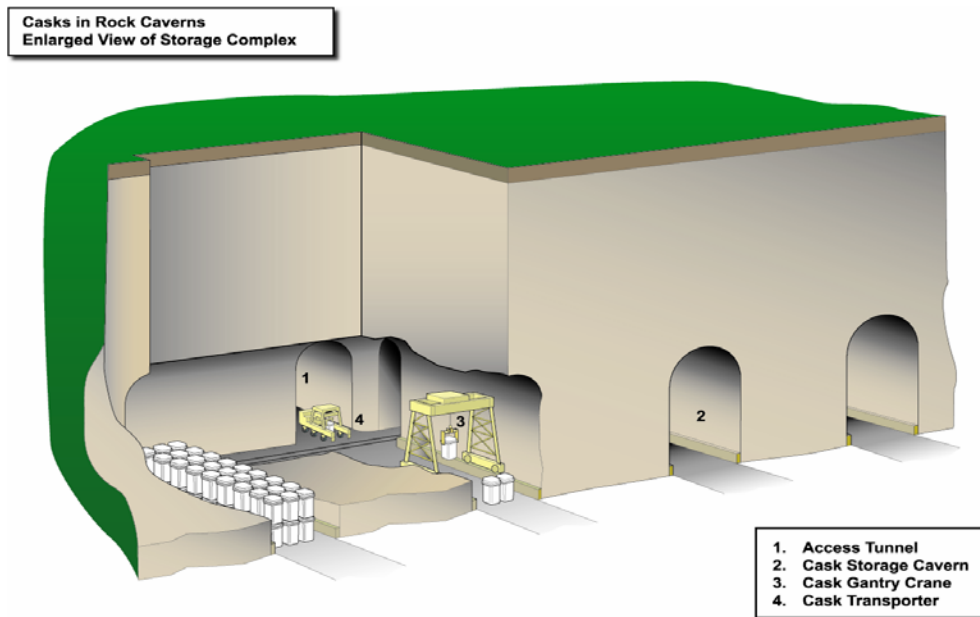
Used Fuel Storage in Shallow Rock Caverns at Central Facility – Underground View
